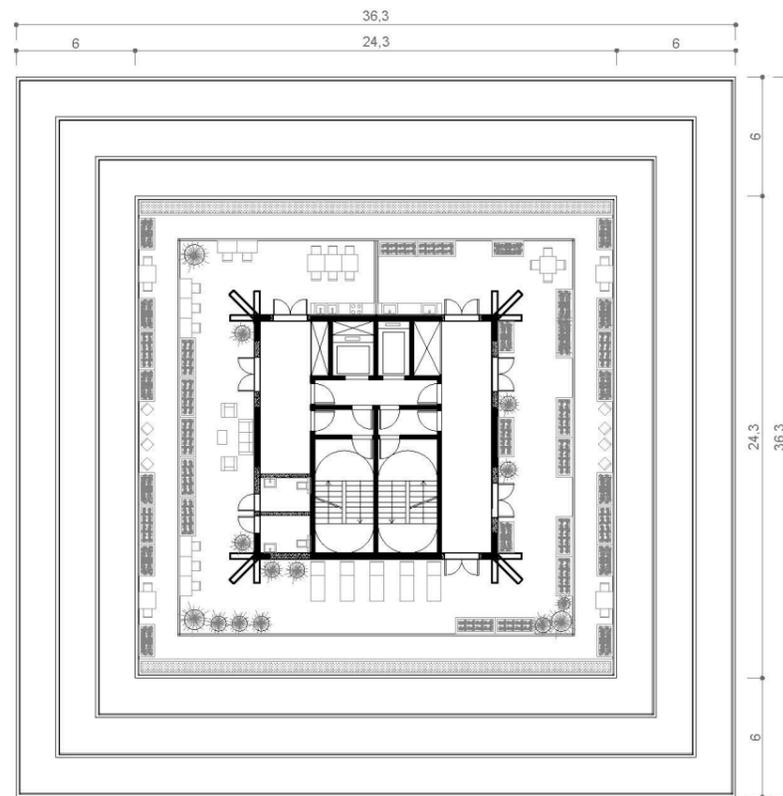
Prototype 2 – Steel Tower typology: Rooftop plan
